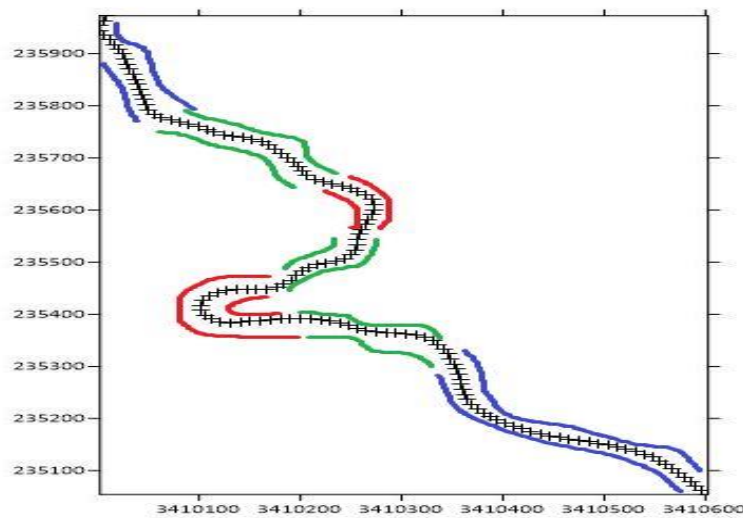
Location of Retaining walls (Red), Breast walls (Green) and Toe walls (Blue) along the road plotted in Surfer
